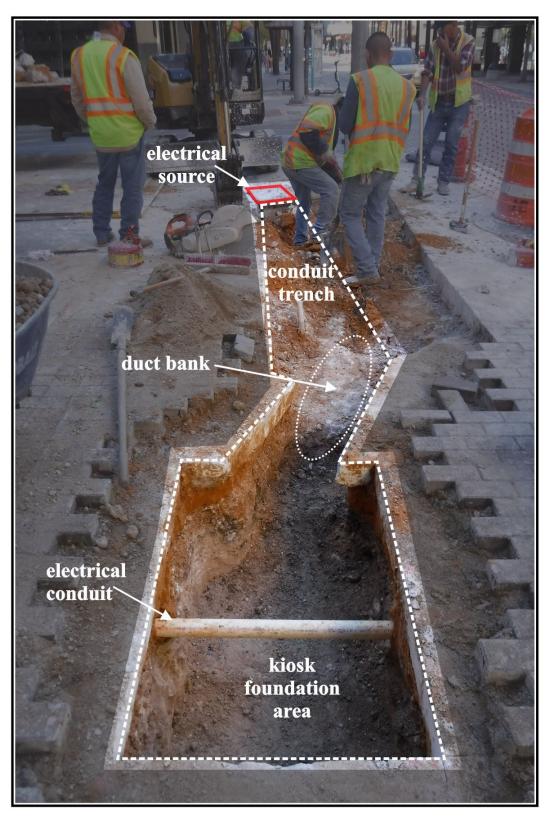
Excavated areas for Kiosk 3 foundation and conduit trench; note existing electrical conduit in foundation pit and duct bank in conduit trench, both left undisturbed (view west).
